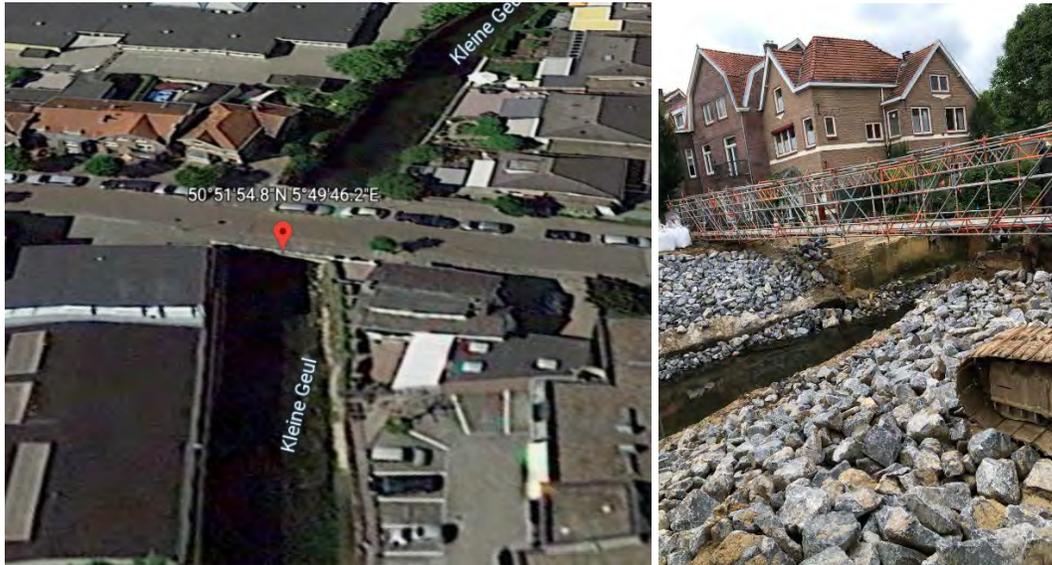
Temporary pedestrian bridge in place of a destroyed two-lane bridge (50°51'54.8"N 5°49'46.2"E)
